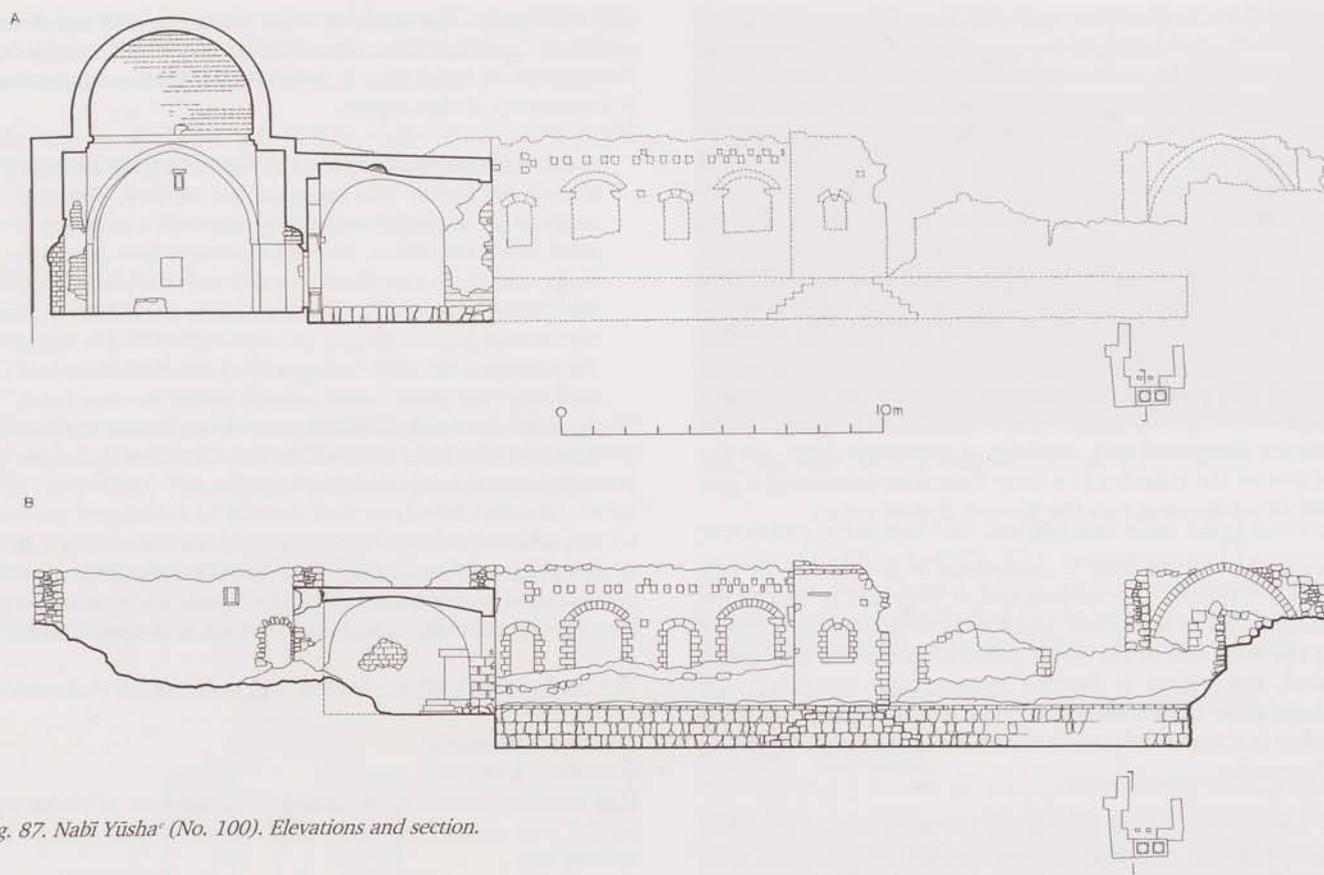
Nabī Yūsha' (No. 100). Elevations and section.
